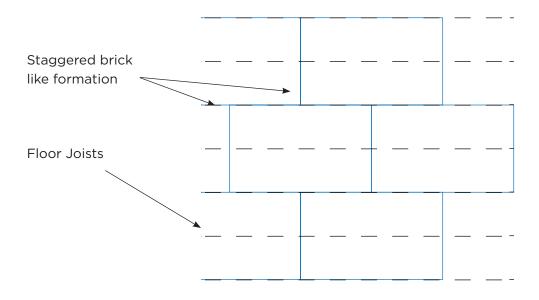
MagRoc 'Typical' WarmFloor Connection
